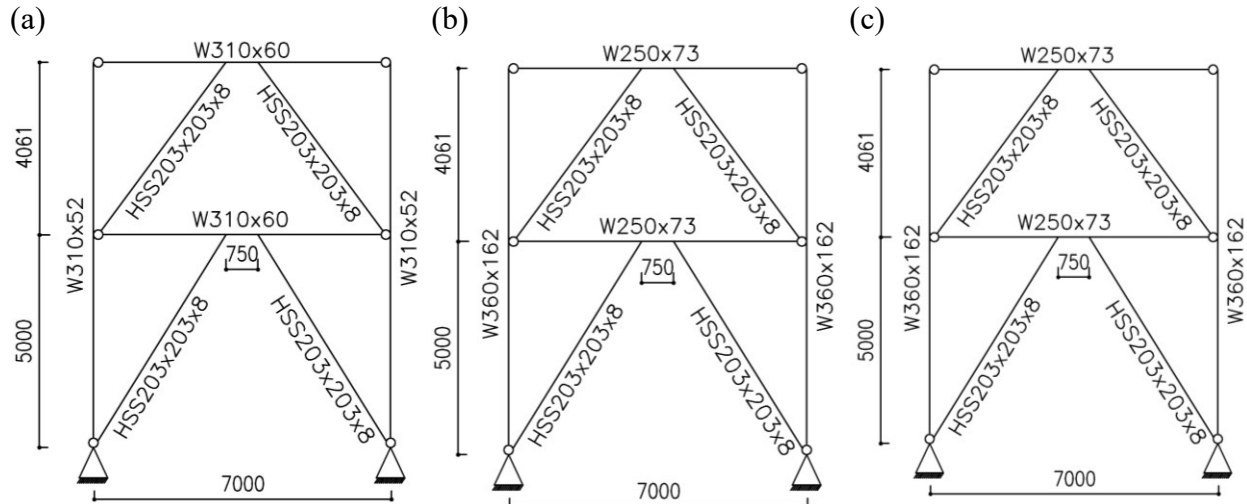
(a) Specimen 1; (b) Specimen 2; (c) Specimen 3 (dimensions in mm).
